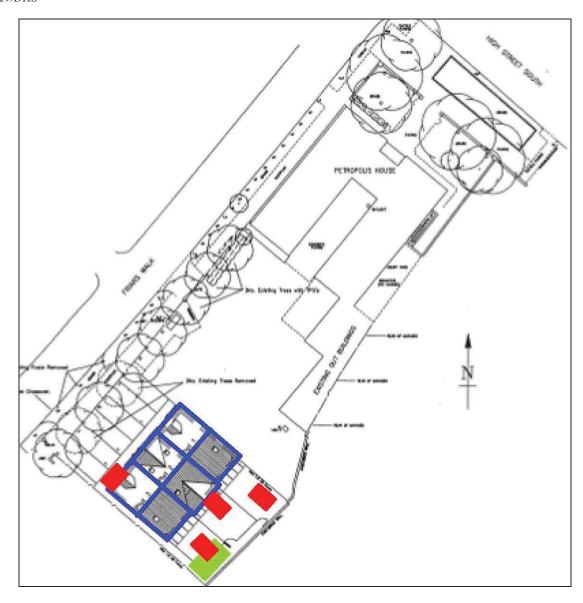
Proposed development showing footings in blue, soak-away in green and geotechnical pits in red *(scale 1:250)
